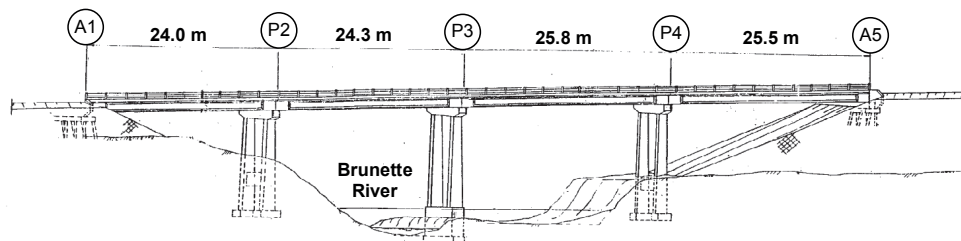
Brunette River Bridge longitudinal section from original design drawings.
